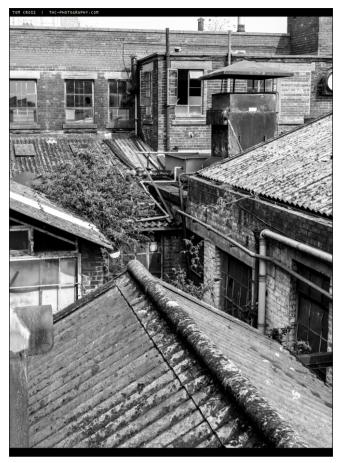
Rear south elevation of Building 6 with small structures around Court 2
